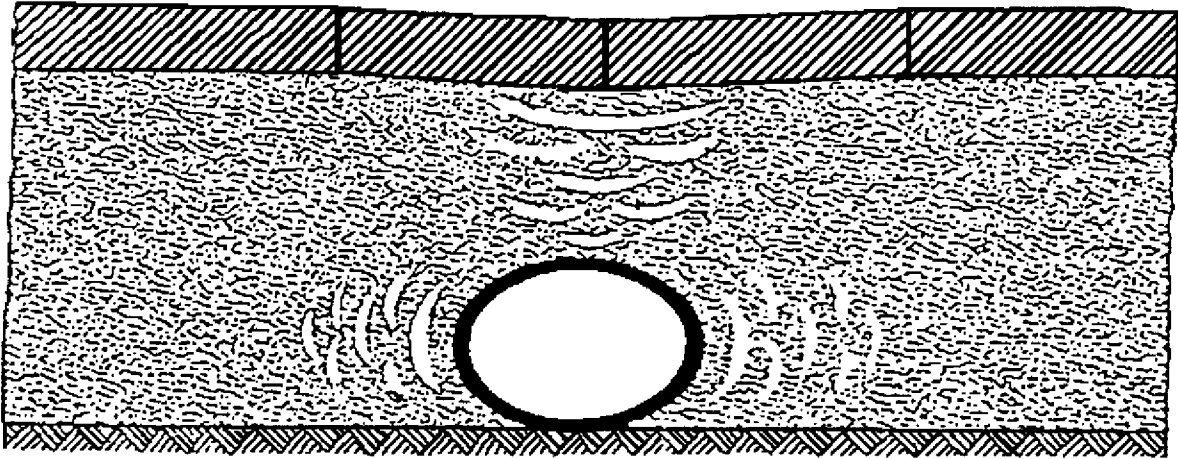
Pavement failure due to inadequate compaction or material quality adjacent to flexible pipe. [Source: *Effects of Loads on Storm Drains and Culverts*, U.S. Army Corps of Engineers]
